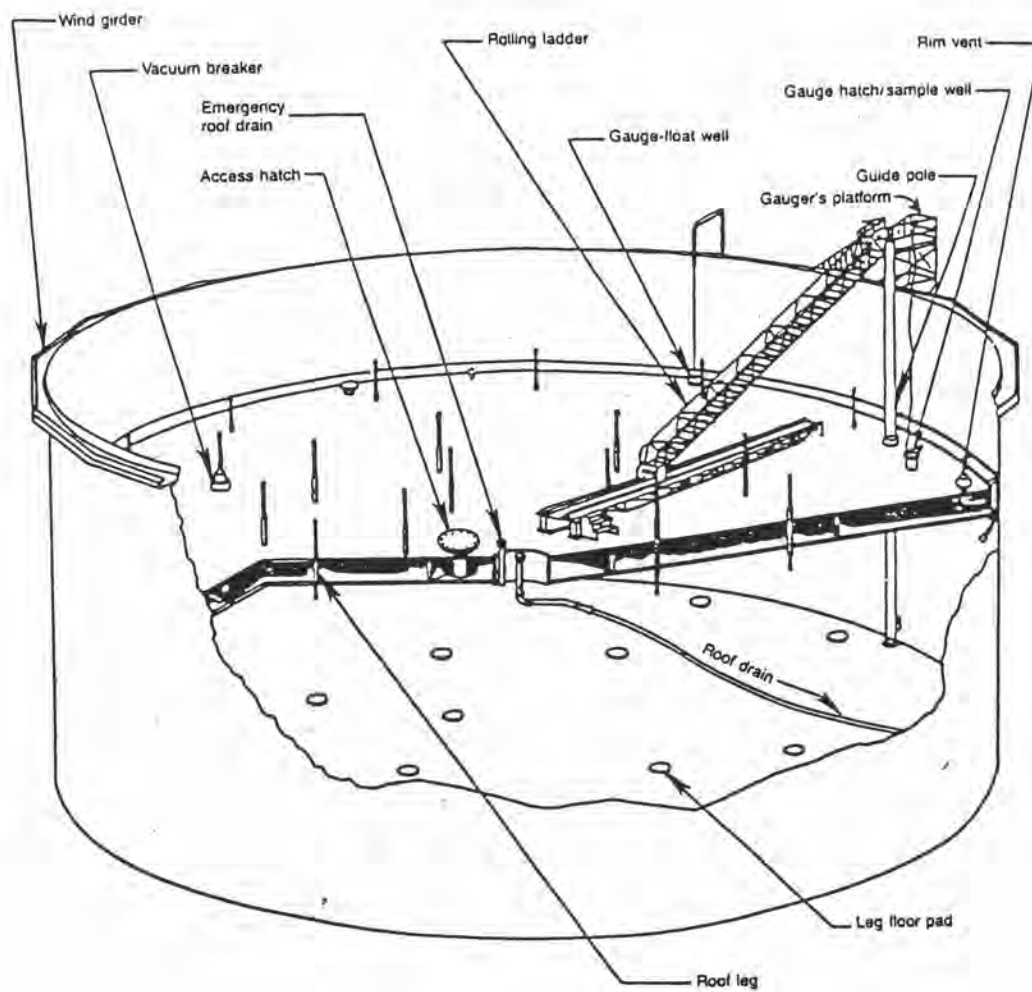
External Floating-Roof Tank with Double Floating Roof [3]
